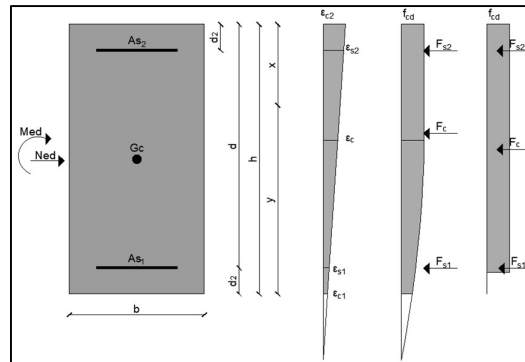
FRC cross-section loaded with bending moment and compressive force (fully compressed section)
